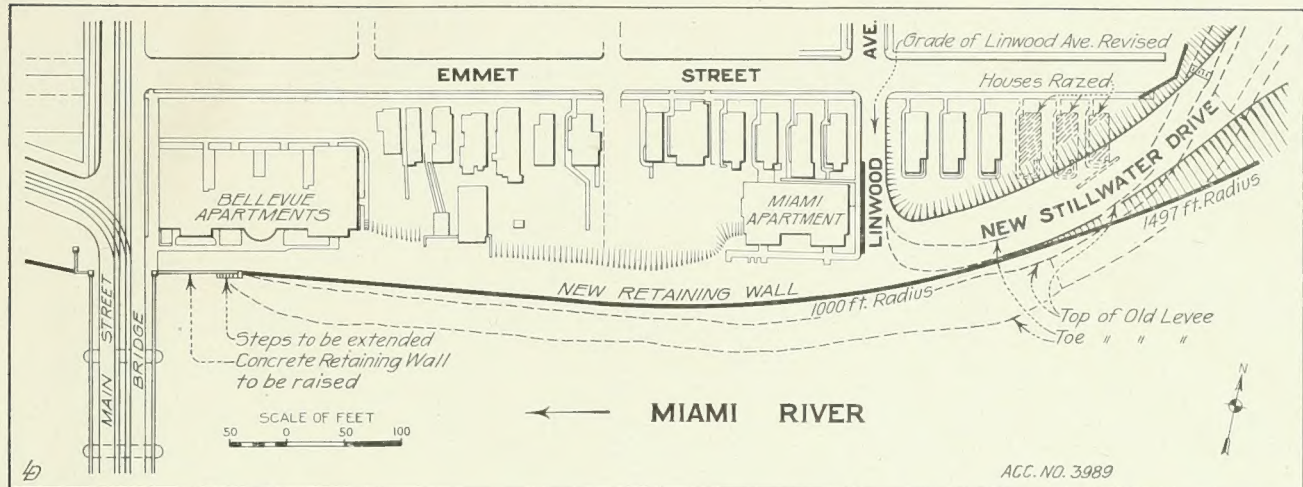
PLAN, STILLWATER DRIVE RIVER WALL, DAYTON
